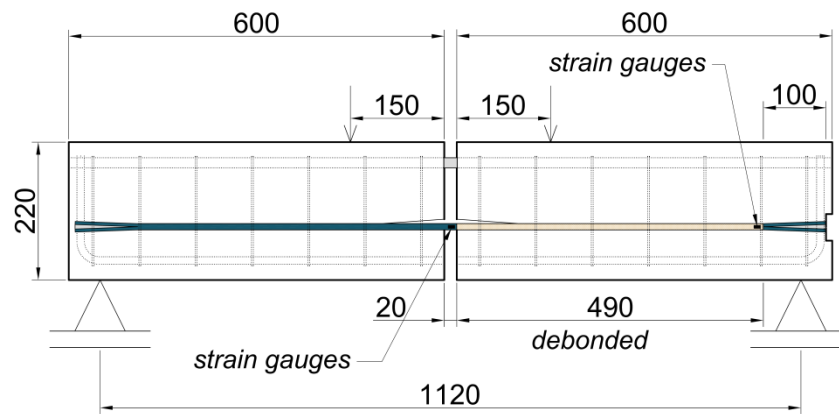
Rectangular hinged-beam specimen (all dimensions are in mm)
